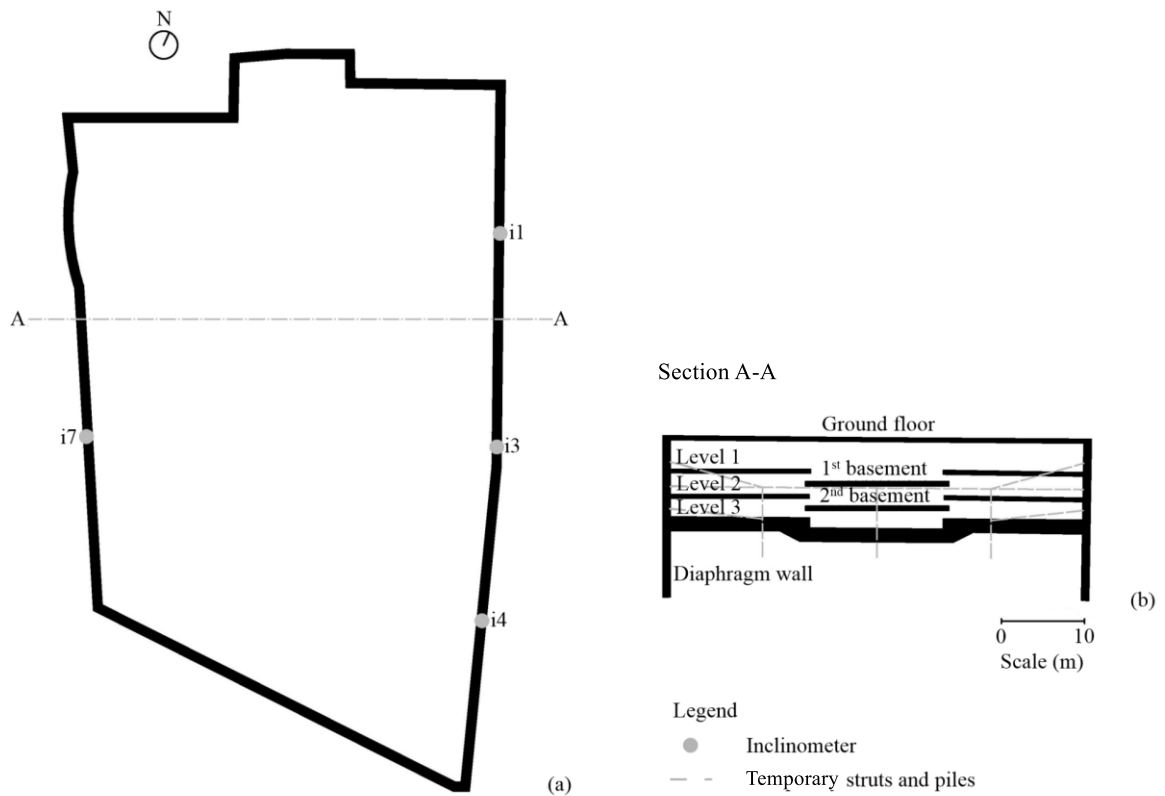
Geometry of analysed problem (a) plan view and (b) cross-section A-A (adapted from Wood & Perrin (1984b))
